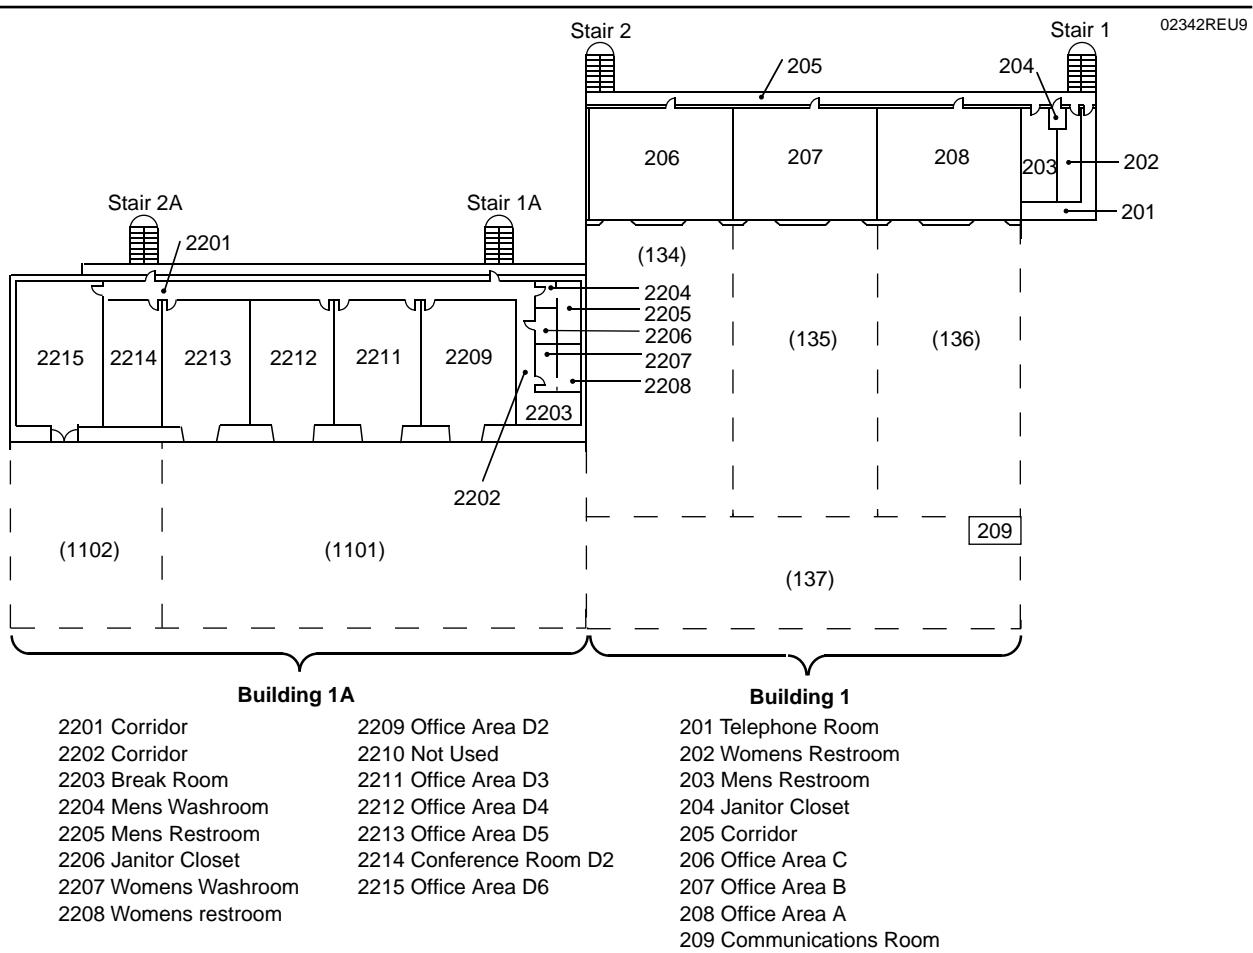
Second-Level Floor Plan, Building 1/1A Astrotech
